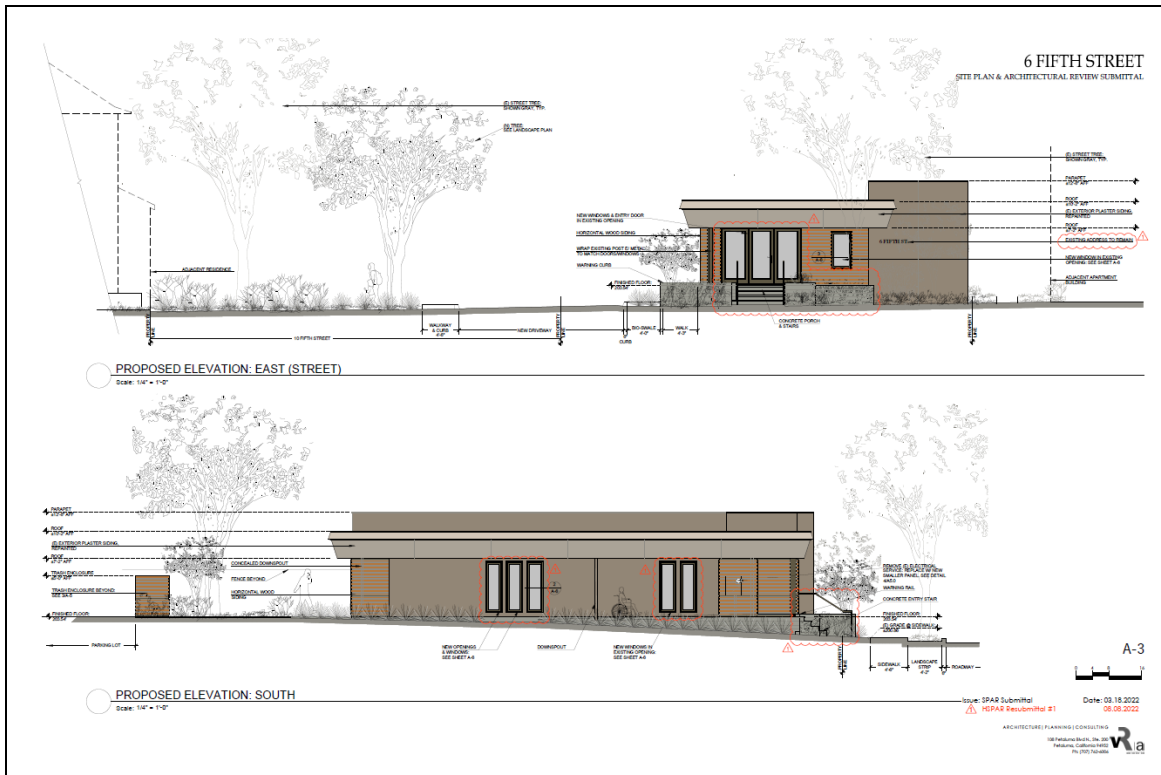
Proposed east and south elevations of the 1963 office building (Steve vonRaesfeld of vR/a Architects, dated 3/18/2022; rev 08/08/2022).
